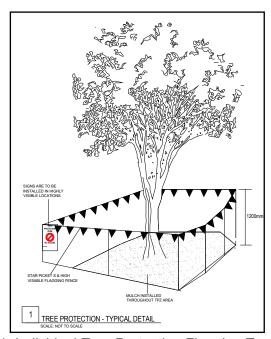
Individual Tree Protection Flagging Typical Detail
